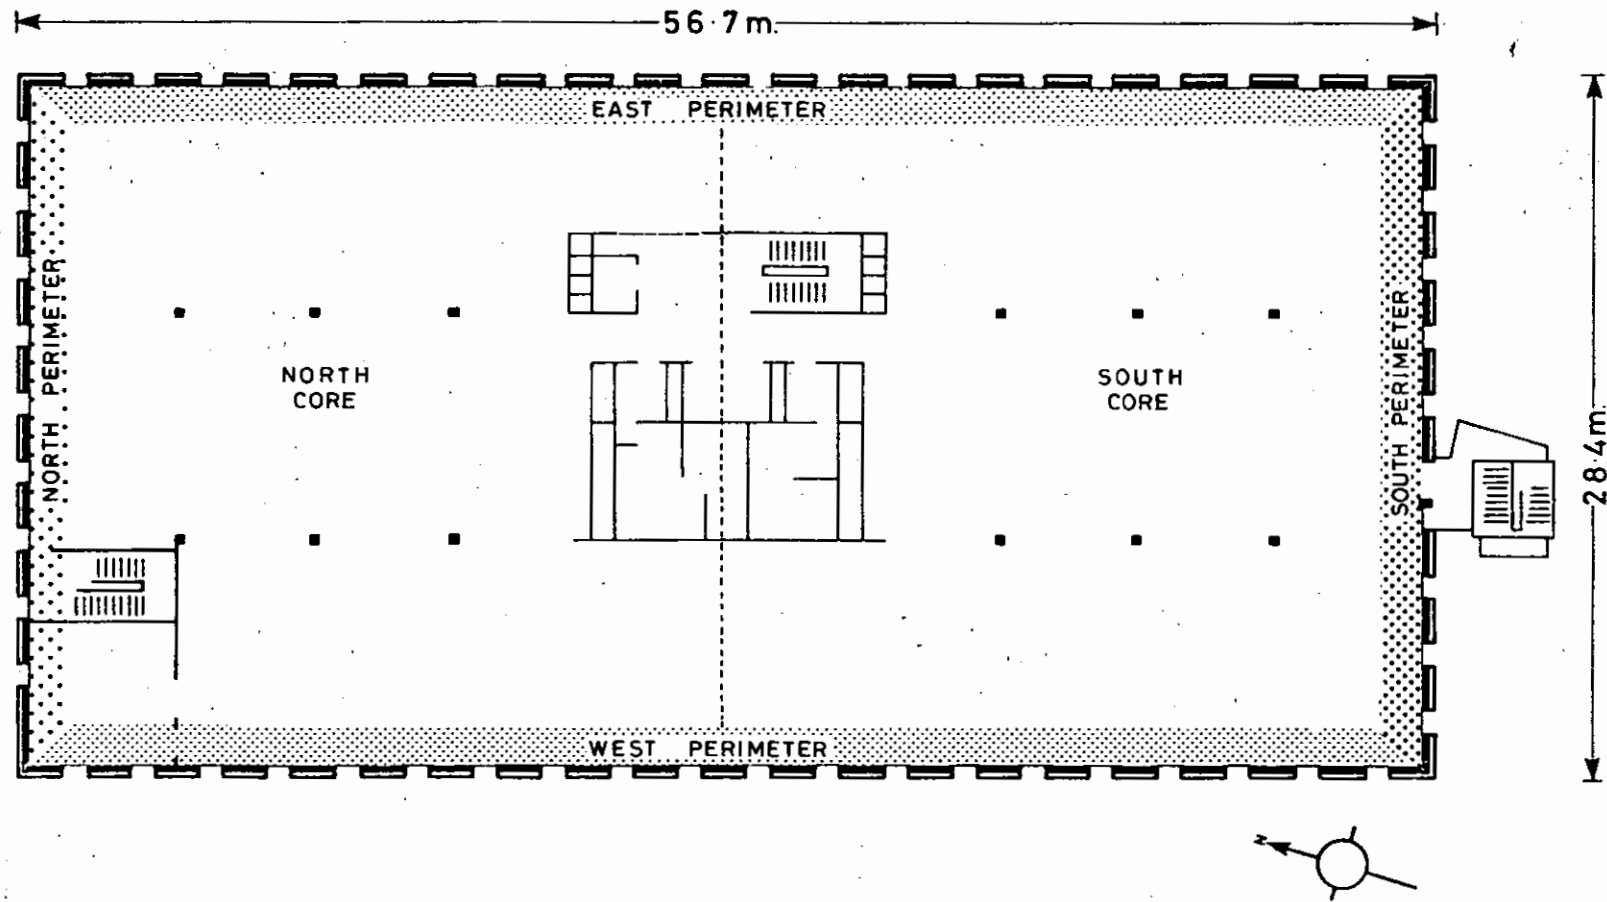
FIRST AND SECOND FLOOR PLAN all perimeter zones 3m deep
